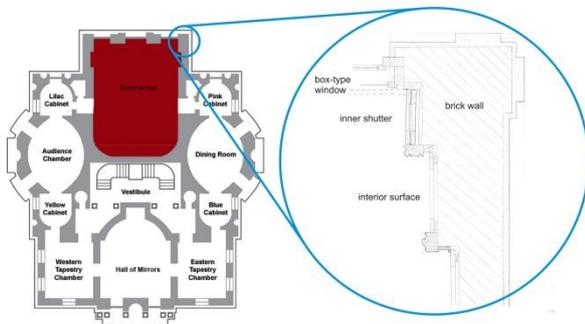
Detail of wall construction with interior surface consisting mainly of framed wood gilded or painted. The opened inner shutter is hidden in a lateral box.
